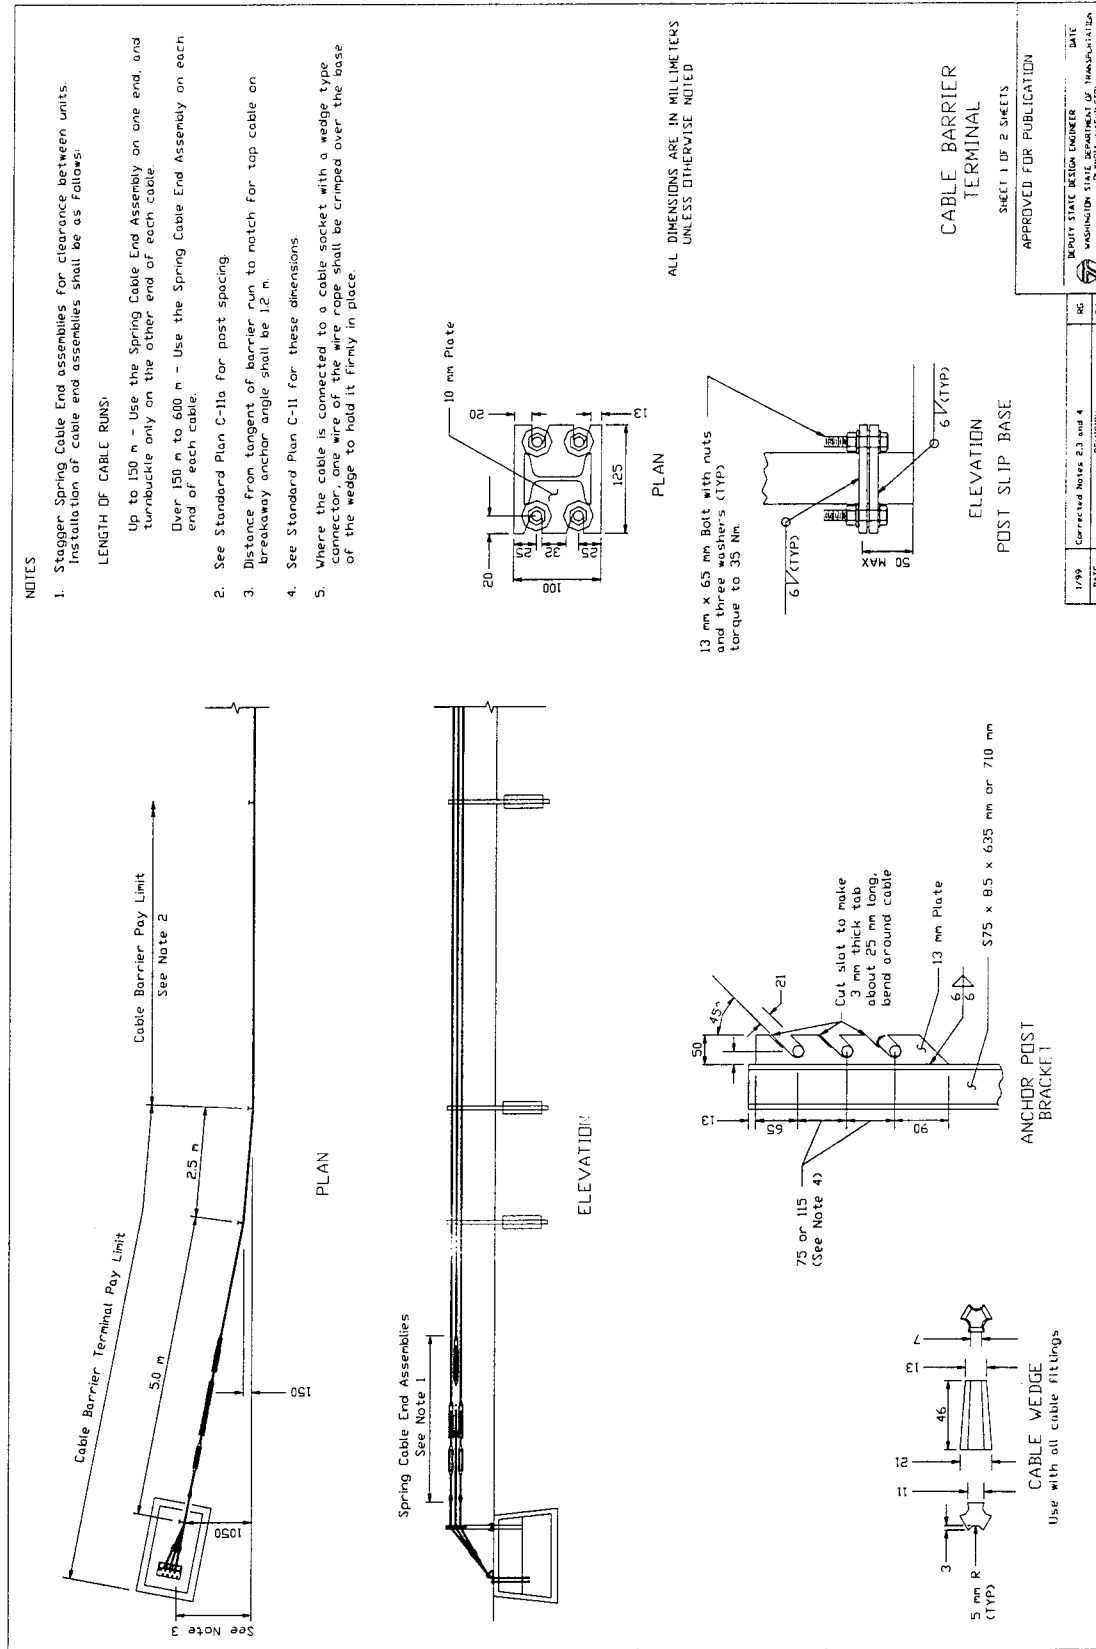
Details of the Washington 3-strand cable barrier for test 404211-8 (continued).
